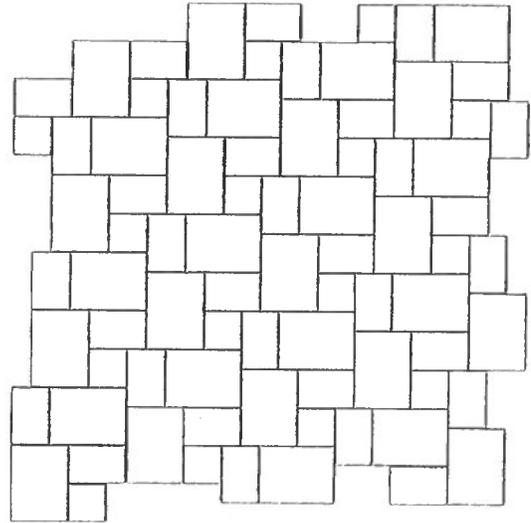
PEDESTRAIN MALL PAVING PATTERN DETAIL
